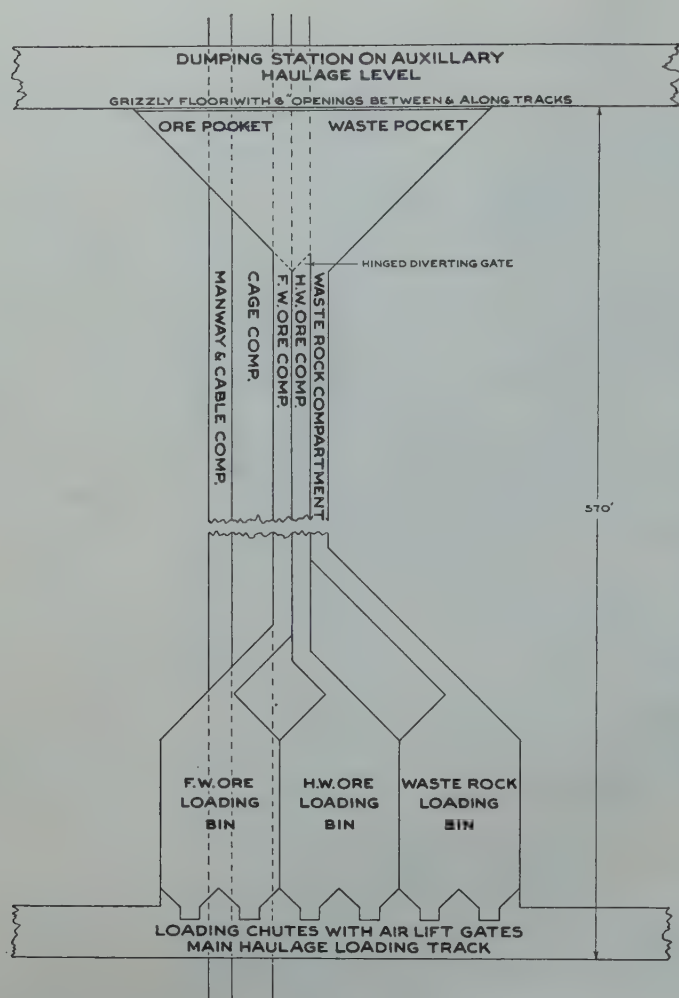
Elevation of shaft at Conda, showing arrangement for handling two classes of phosphate rock, and waste from auxiliary haulage to main haulage level.
